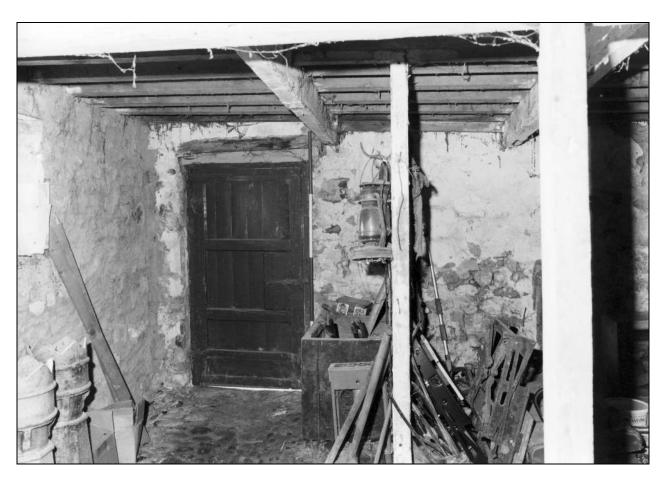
Ground floor: location of horse/pony stalls, from the north-east
